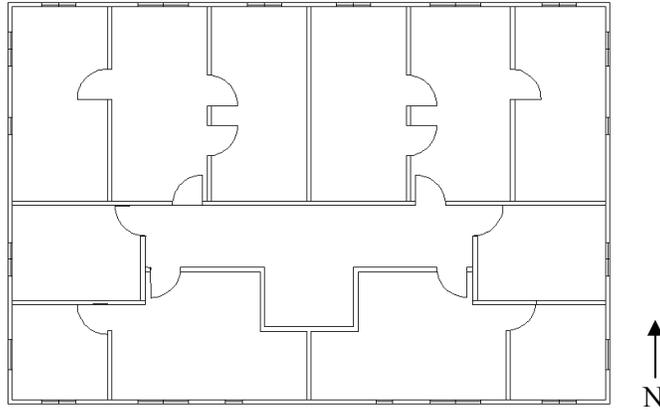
NEESWood Project Floor Layout (Cobeen et al., 2007)
